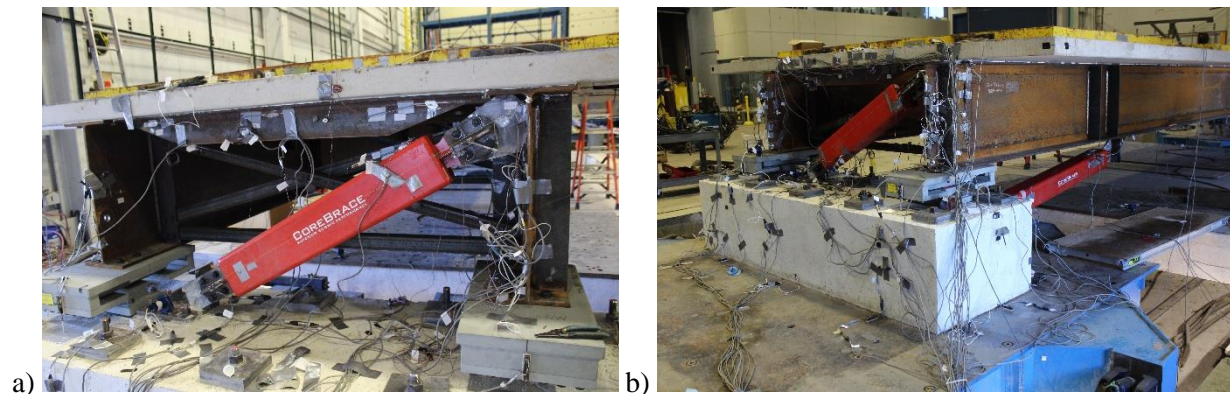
Specimen with BRBs and instrumentation for Configuration I: a) transverse BRB in the west end, b) longitudinal BRB
